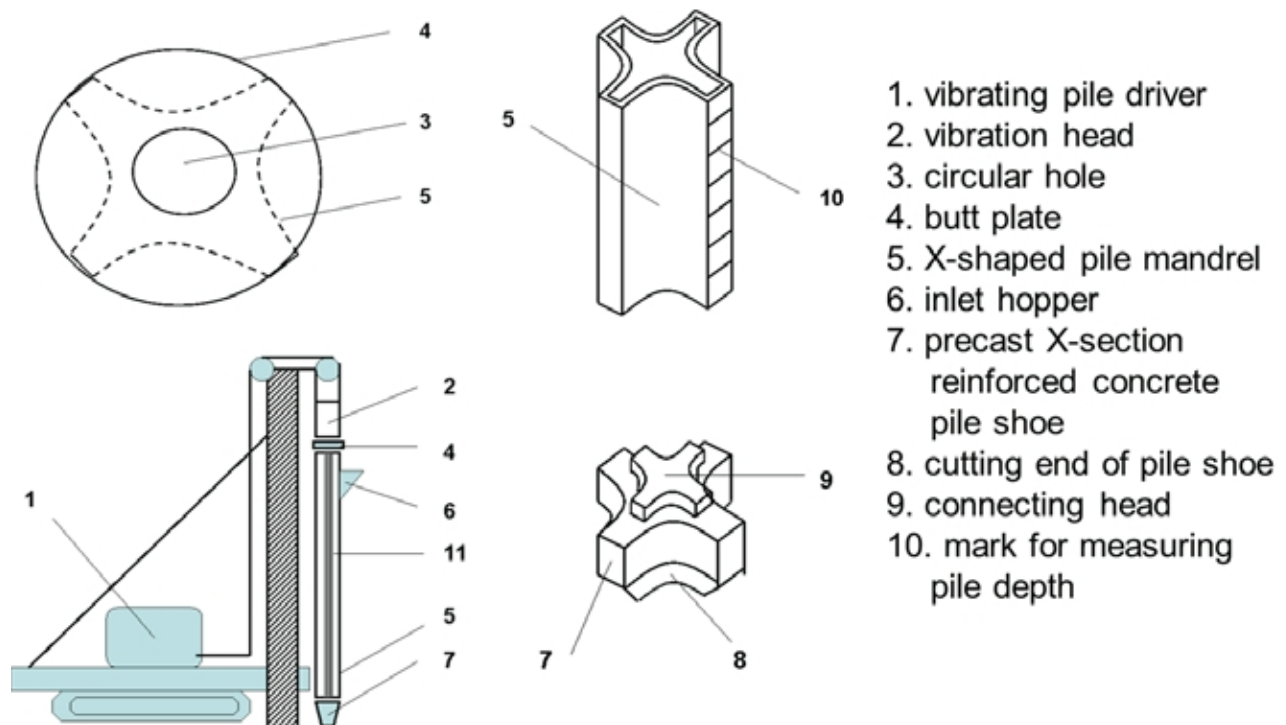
Components of installation equipment of X-shaped piles (Liu and Kong, 2018)
